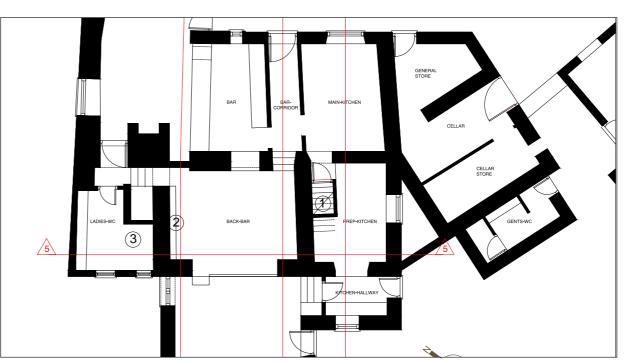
Part Ground Floor Plan Indicating Position of Dangerous Stair, along with Associated Photographs
